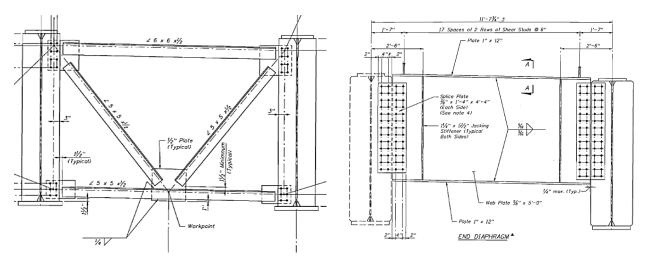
Cross-frame details of the SR-589 Bridge over Hillsborough Avenue
